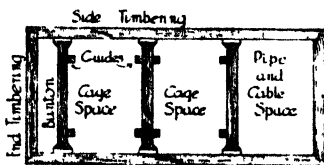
ARRANGEMENT OF WOODEN GUIDES
